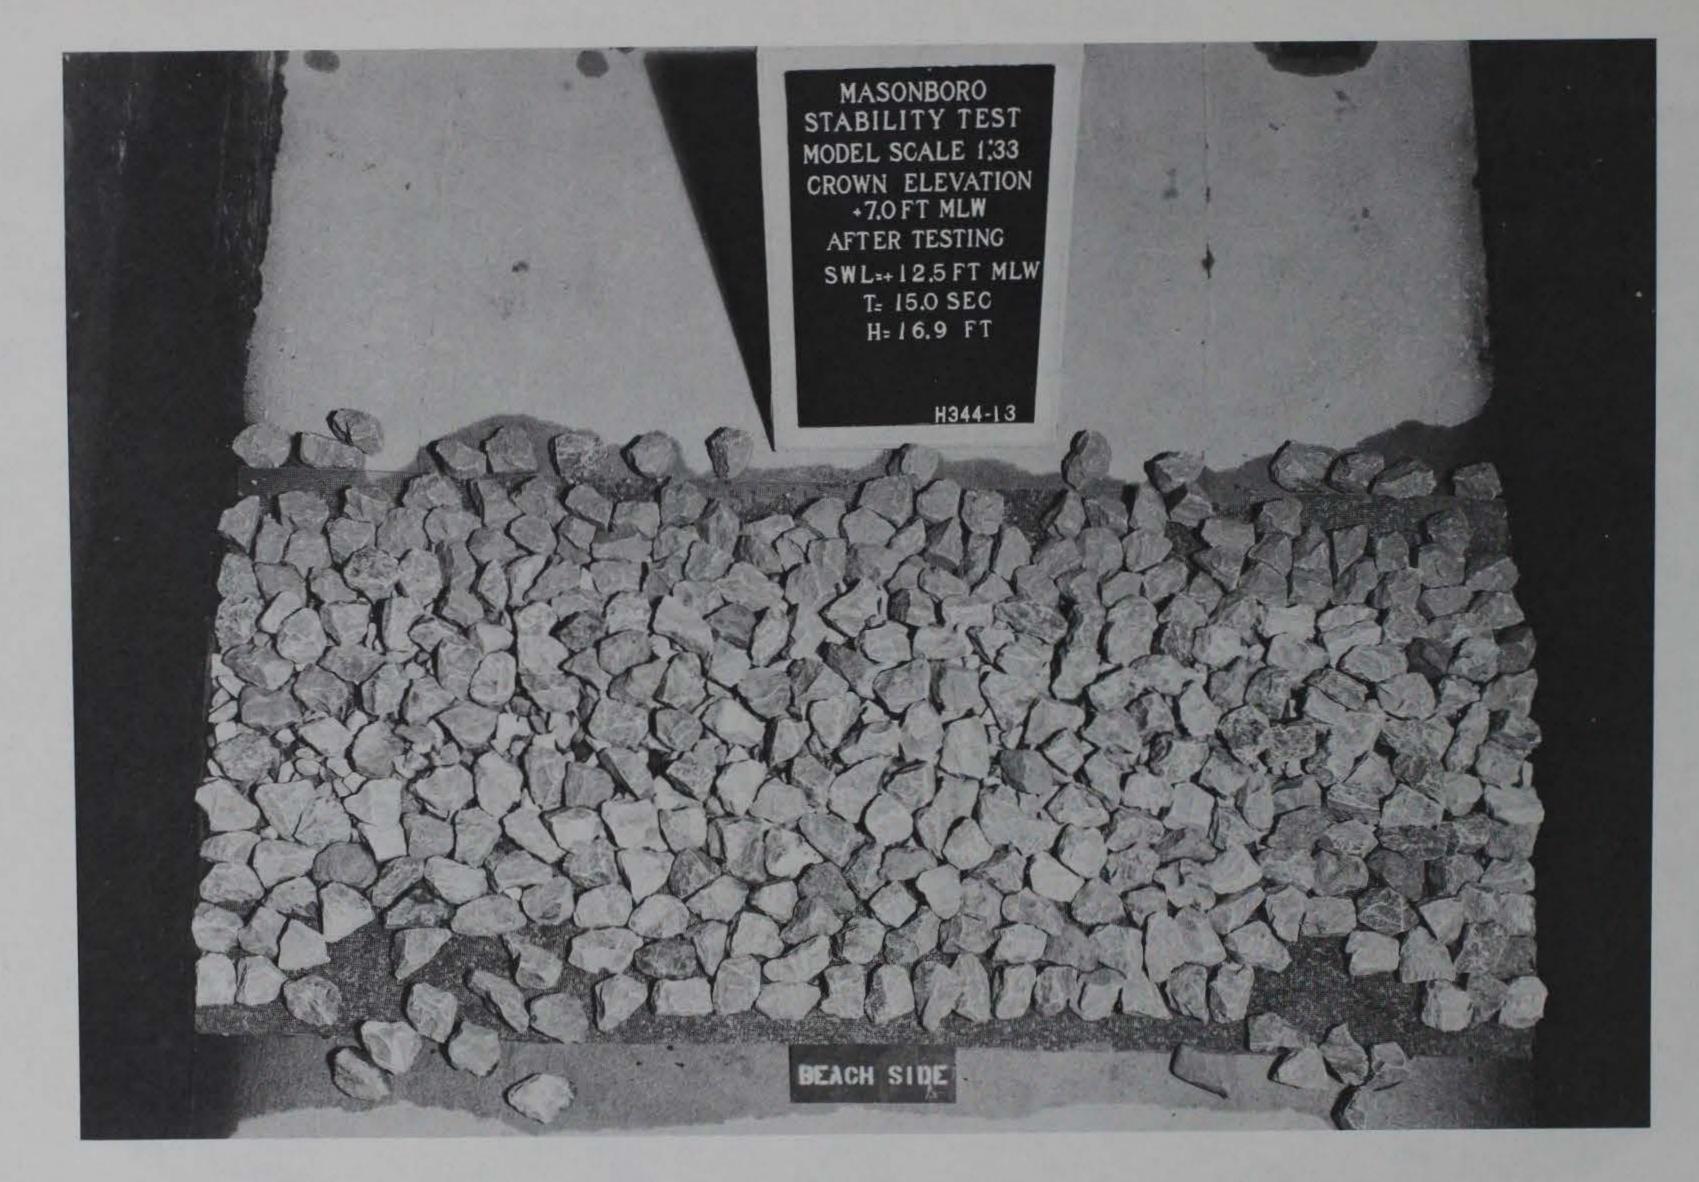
Overhead view of Plan 3 after attack of 15-sec, 16.9-ft waves at an swl of +12.5 ft mlw for 2 prototype hr
